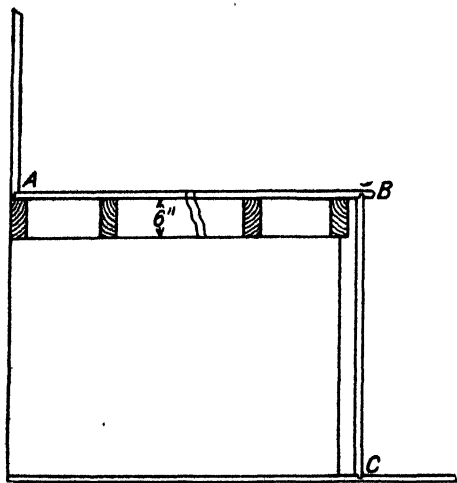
DIAGRAMMATICAL PLATFORM CONSTRUCTION, SHOWING POSITIVE CONNECTIONS AT A, B, AND C
